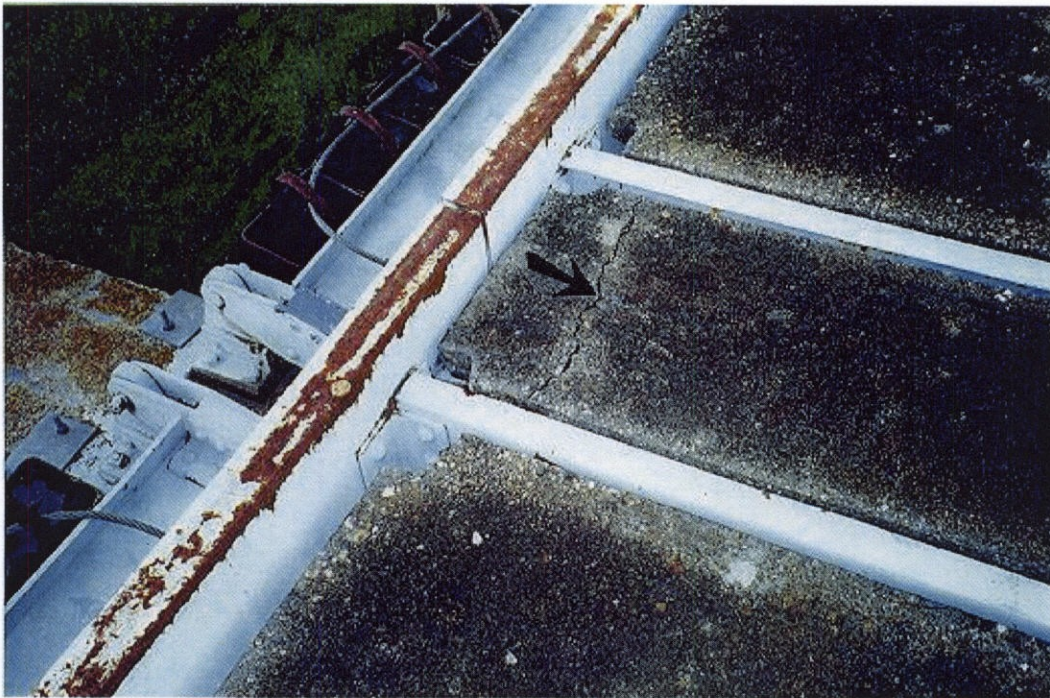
Panel L171e (note medium size crack from one end to the other of panel).
